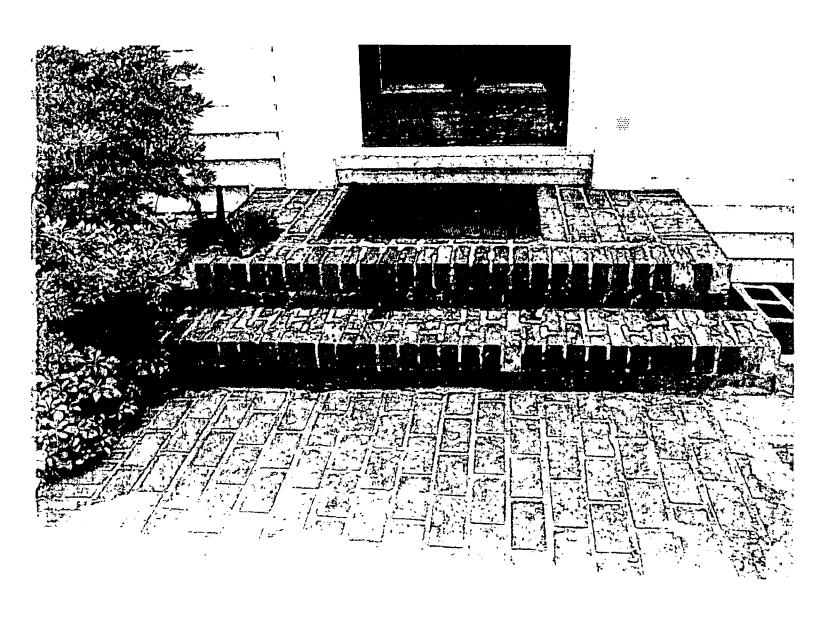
Picture E shows the front walk with the damaged brick removed so the new flagstone can be installed flush with the existing brick sidewalk.
